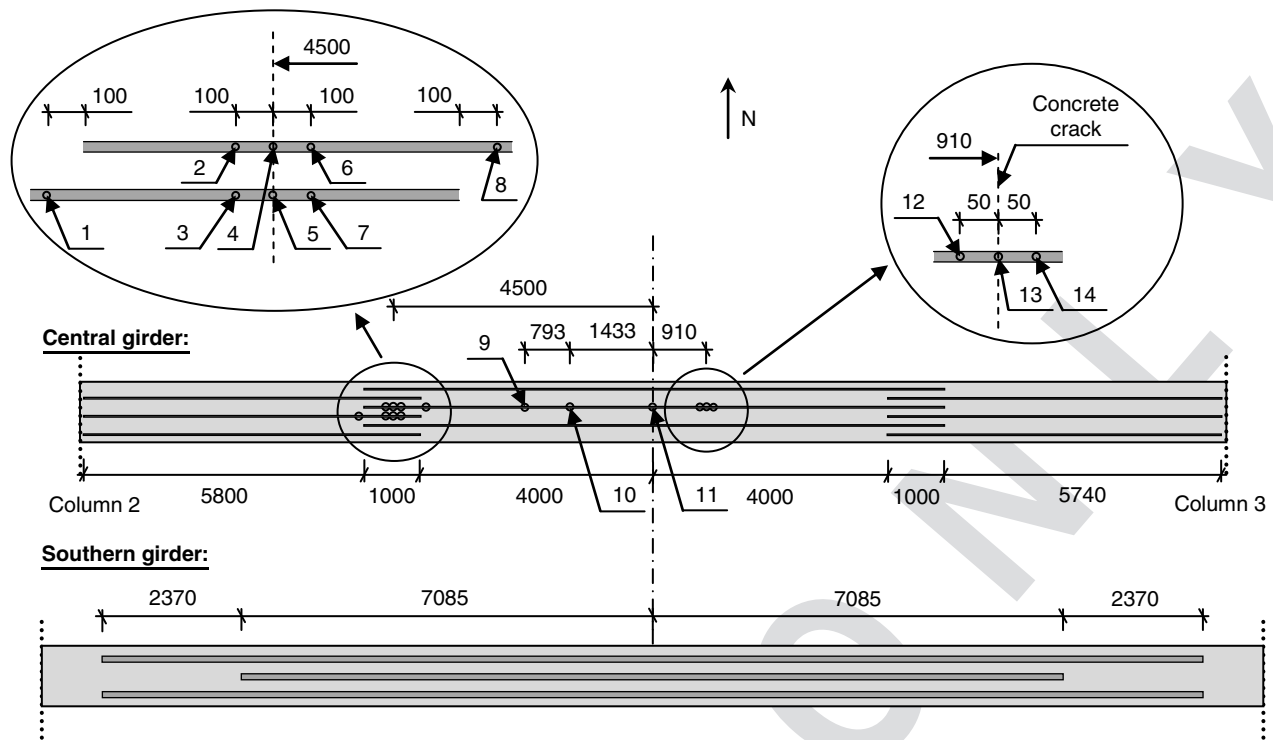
Strengthening of the Kiruna Bridge: three overlapped NSM CFRP bars on the central girder, and three prestressed CFRP laminates on the southern girder; strain gauges on the NSM are numbered 1–14; note: dimensions are given in mm
